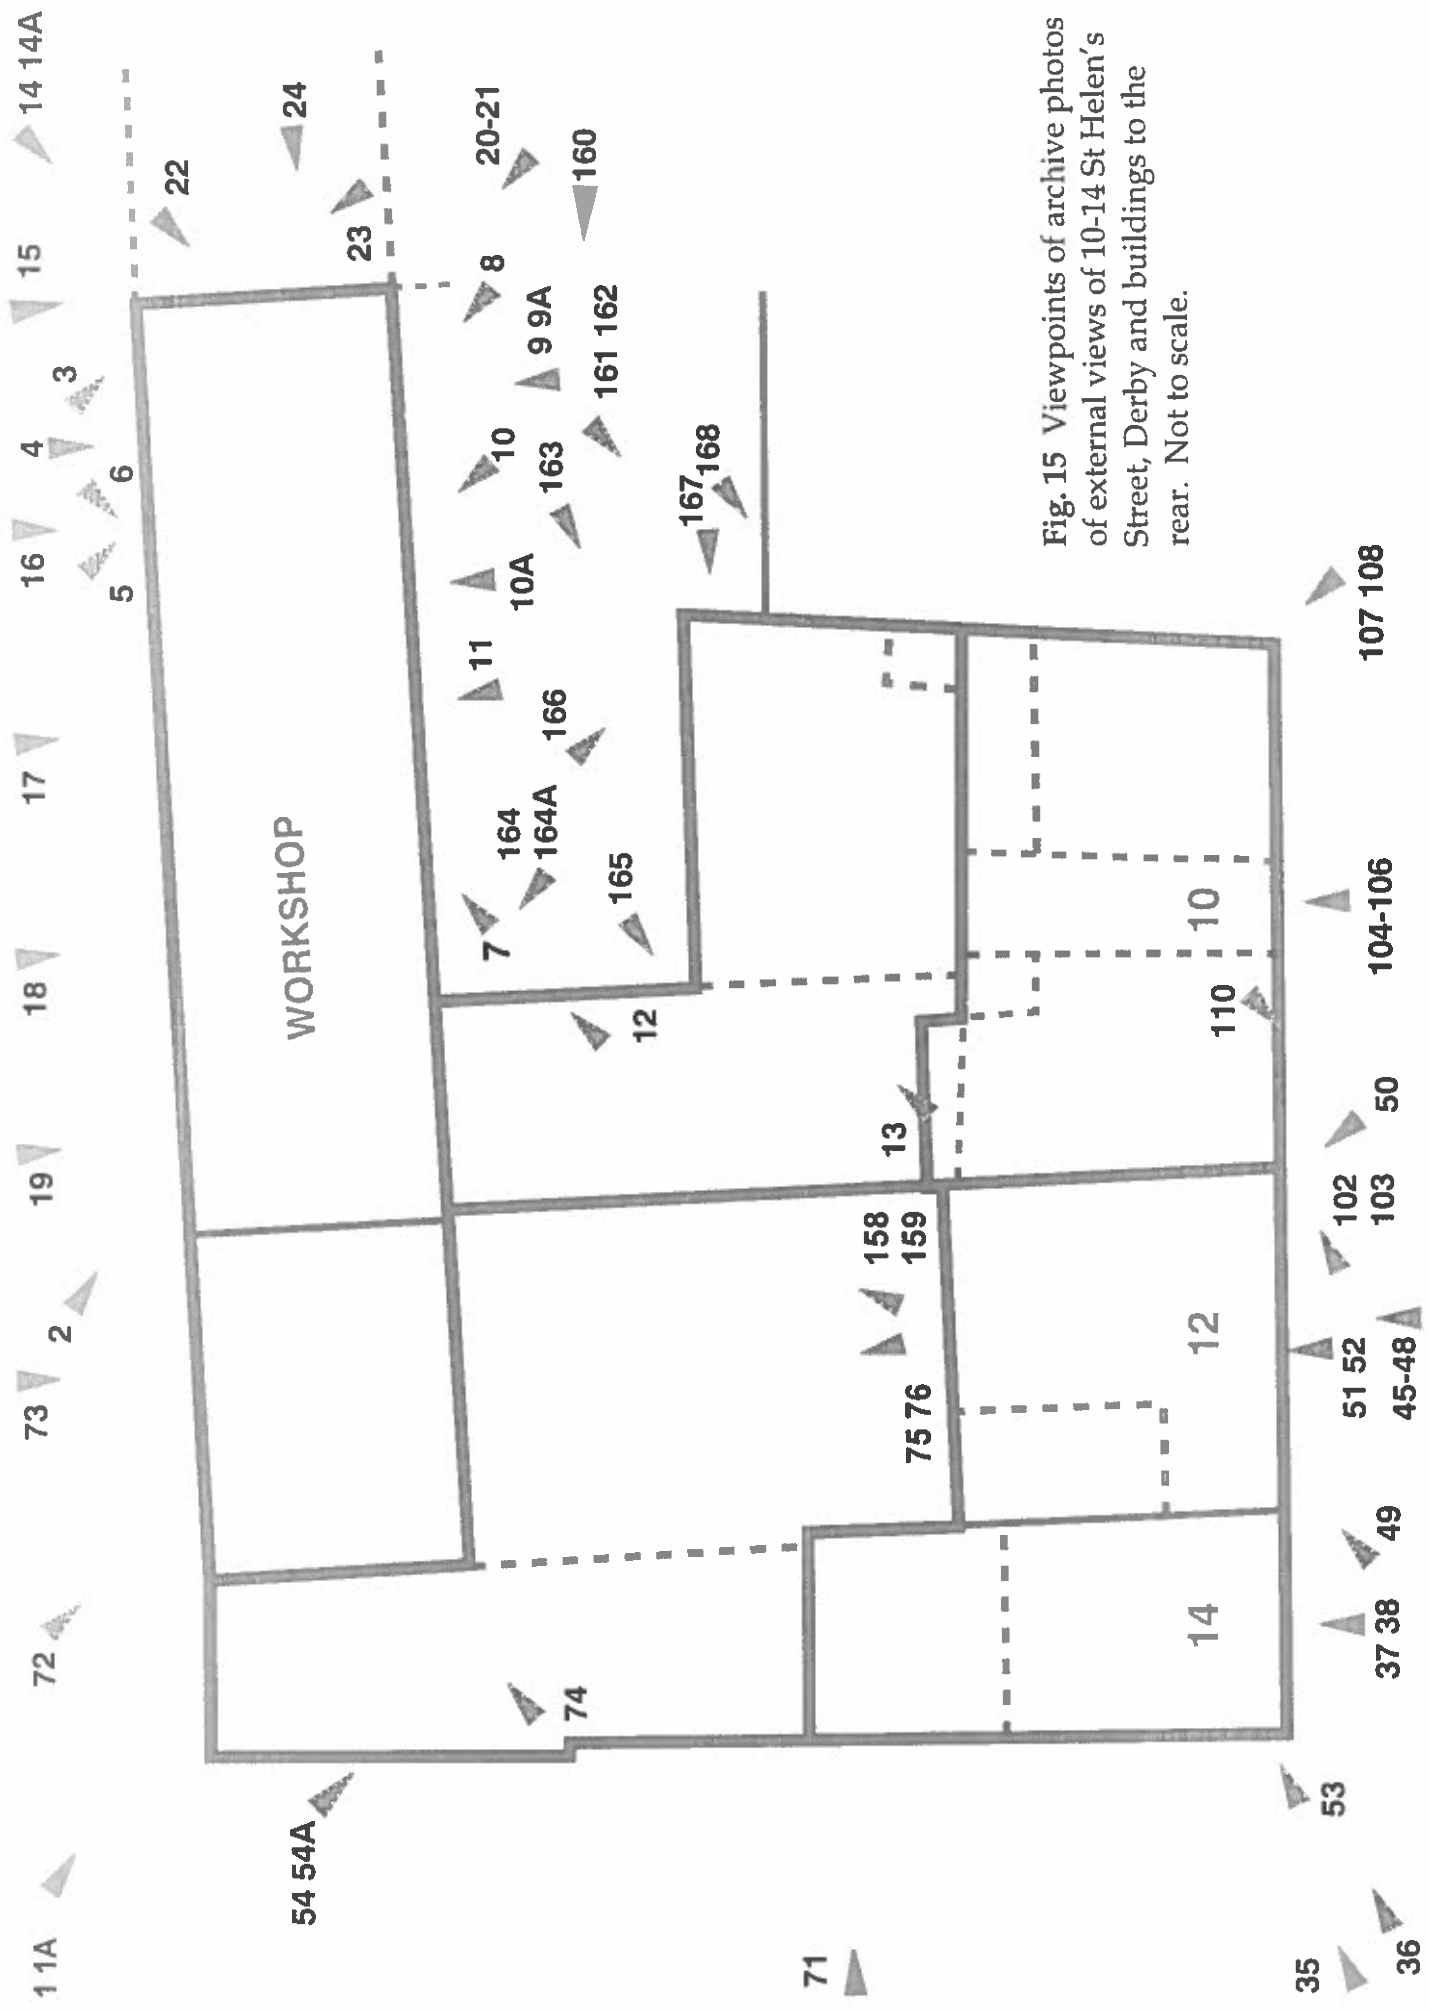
Viewpoints of archive photos of external views of 10-14 St Helen's Street, Derby and buildings to the rear. Not to scale.
